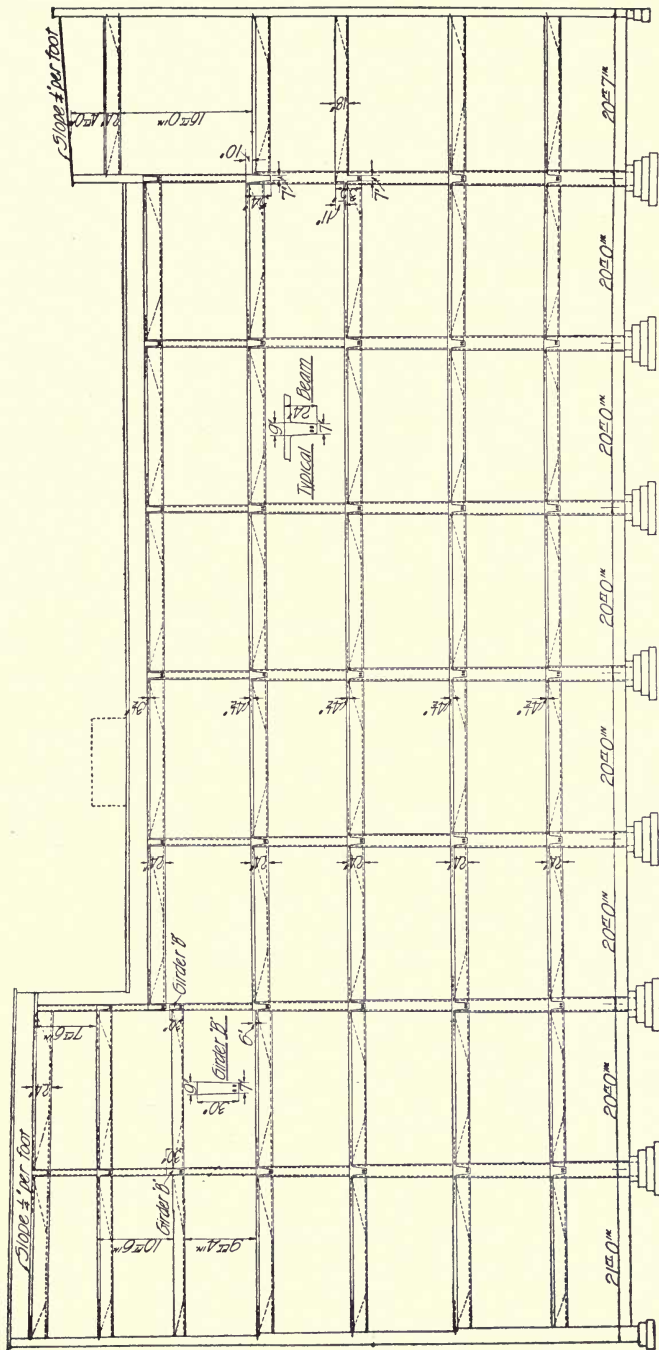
Longitudinal Section of Forbes Cold Storage Warehouse. (See p. 160.)
